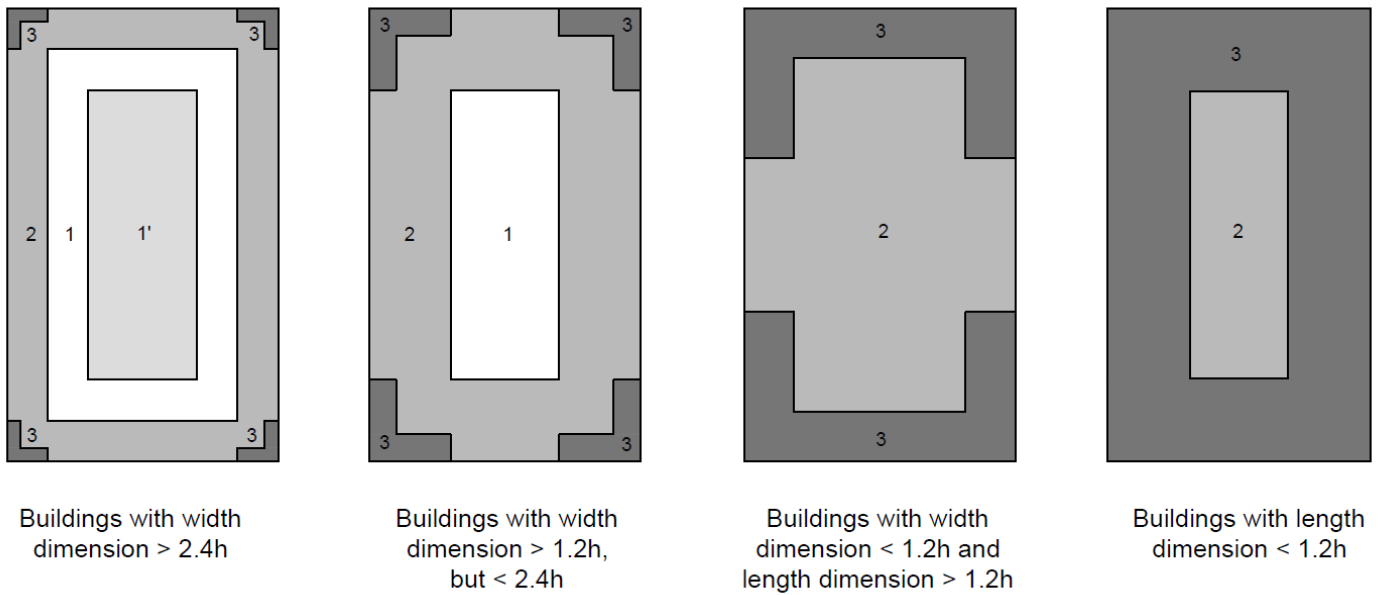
Four possible scenarios for roof zones depending on the ratios of plan dimensions to the roof height.
